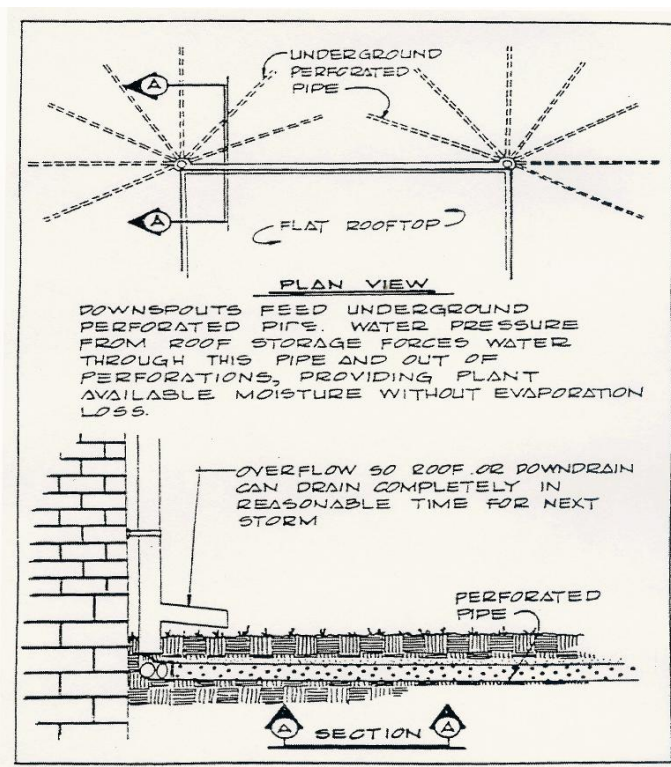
Downspout Connected to Infiltration Trenches Spread Out to Provide Underground Moisture to Lawn. Source: Baltimore SWM Manual
